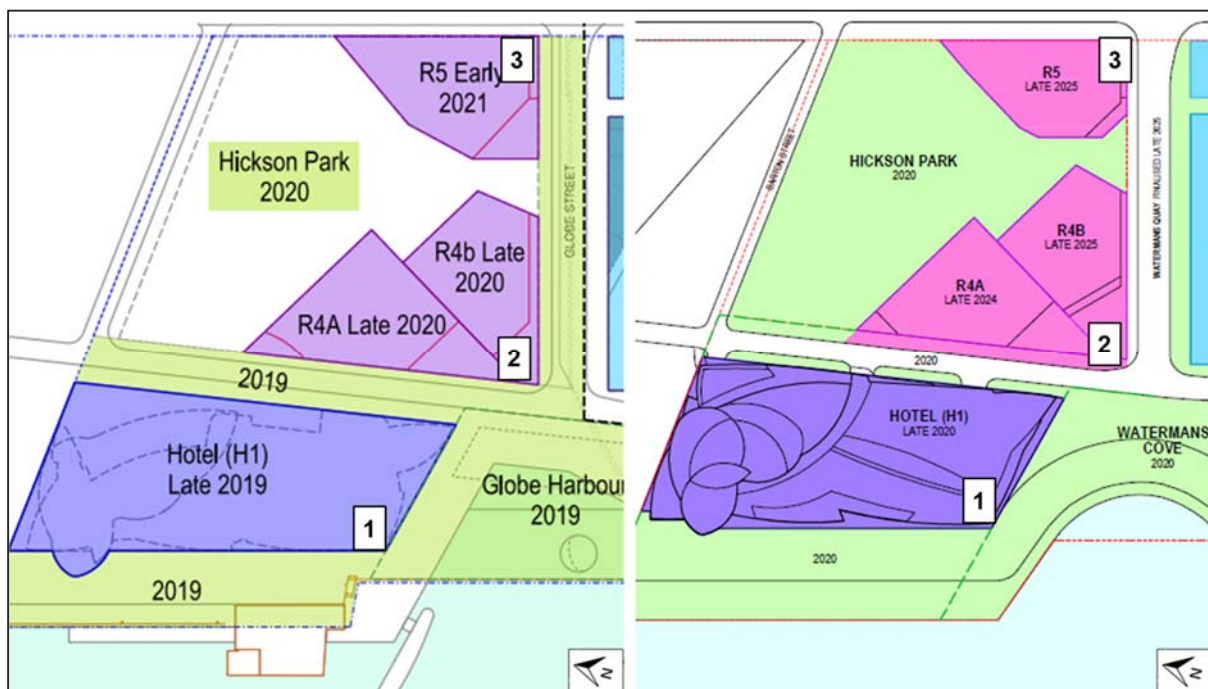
| MOD8 (left) and current proposed (right) indicative construction staging plan for the northern end of Barangaroo South (Base source: MP 06_0162 MOD 8)
